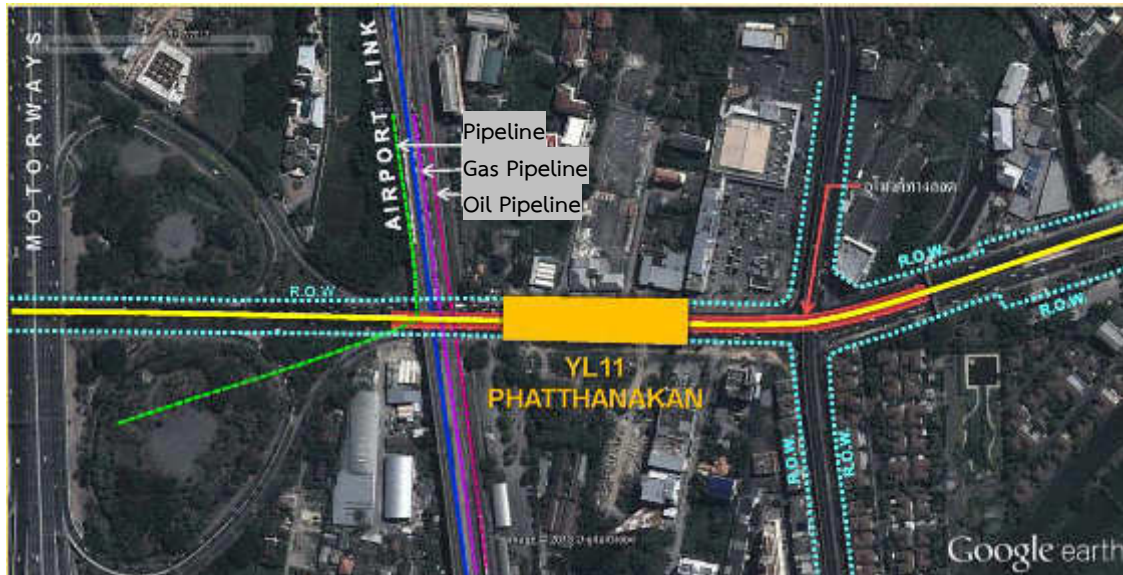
12 Plan and Cross Section of Guide Way on Phatthanakan Underpass Tunnel
